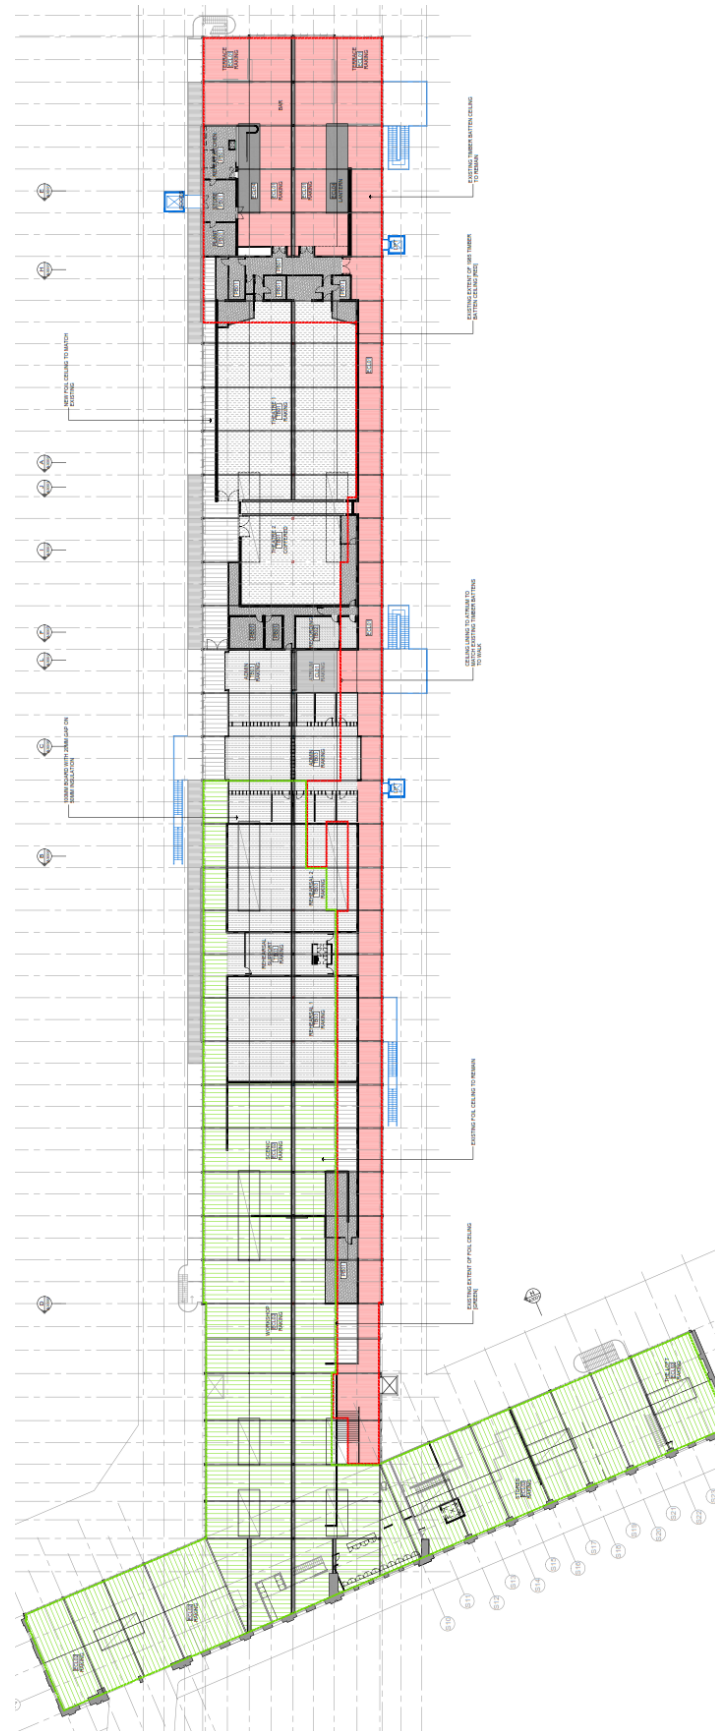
Proposed Level 2 Ceiling Plan. Highlighted in red the extent of foil ceiling retained and in red the extent of timber batten ceiling retained.
